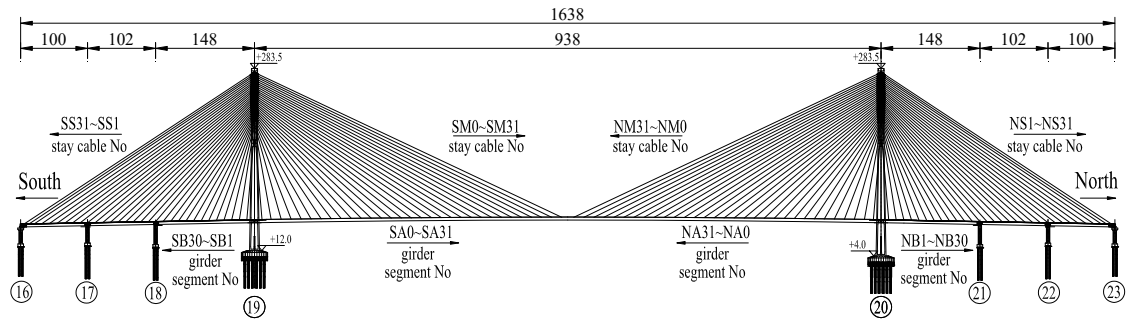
Elevation layout of Wuhan Qingshan Yangtze River Bridge (unit: meter)
